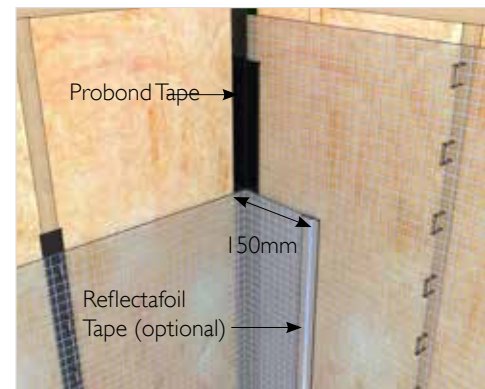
Corner joint detail showing fixing placement through Probond Tape
